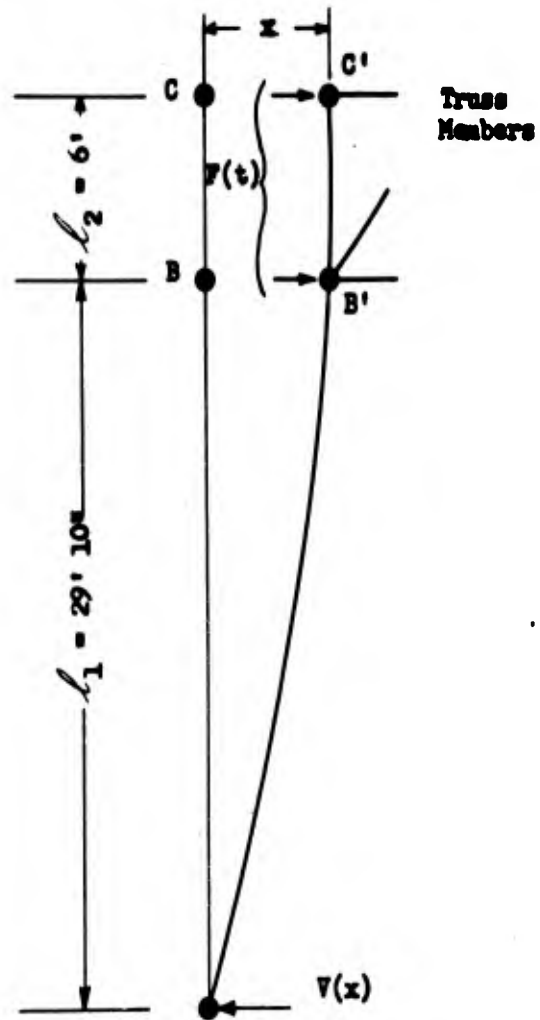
Deflection of Typical Column of Building 3.3.3
